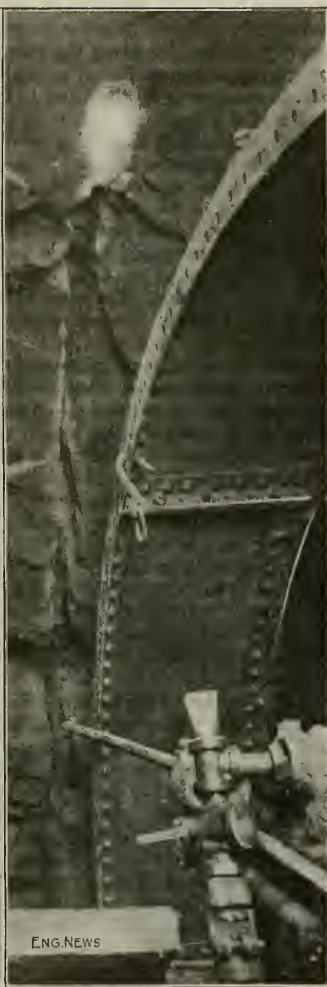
CUTTING GROOVE FOR STEEL DIAPHRAGM
